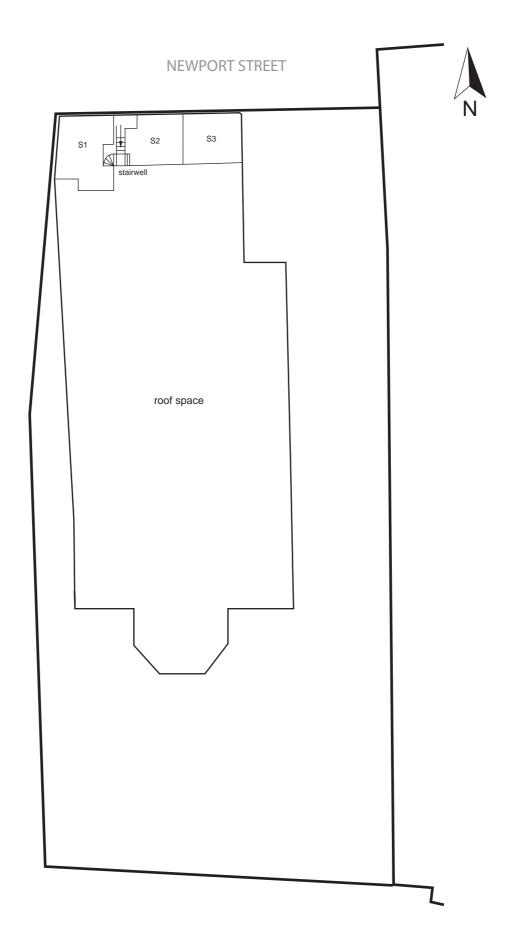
The Electric Bingo Hall, second floor plan (nb. not to scale).
